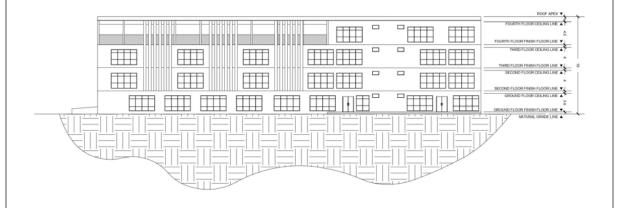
Office, Store and Factory Floor Plan: Rear Elevation
